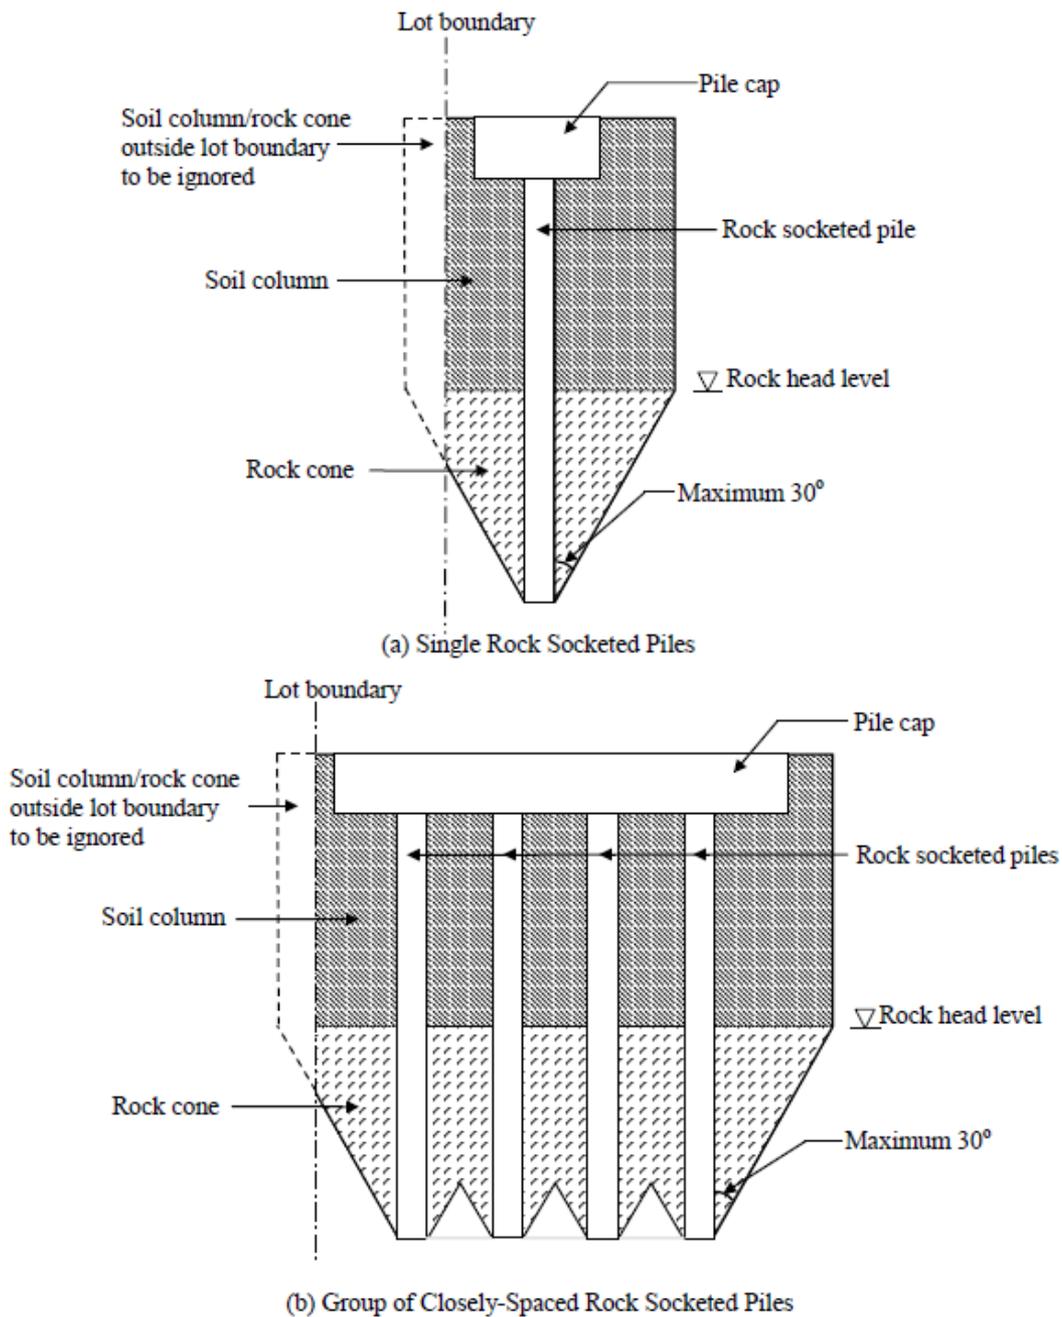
Configuration of Rock Cone/Soil Column for Rock Socketed Piles
